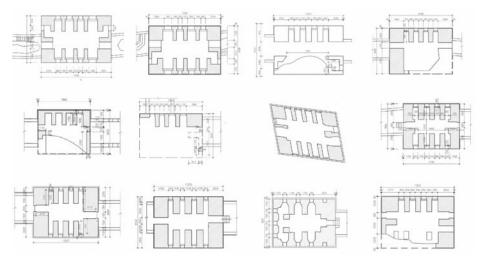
Typology 1-4: Floor Plan of No. 3, 4, 8, 16, 23, 24, 26, 29, 31, 32, 42, 49
